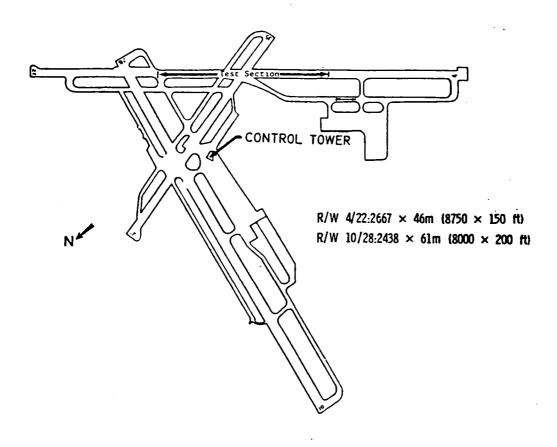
RUNWAY SCHEMATIC FOR NASA WALLOPS FLIGHT FACILITY SHOWING LOCATIONS OF TEST SECTIONS
